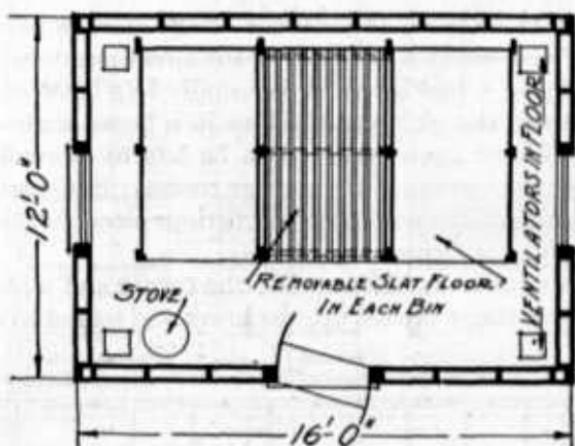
Floor plan of a small sweet-potato storage house (12 by 16 feet) suitable for a farmer who has 300 to 500 bushels of sweet potatoes to store.
